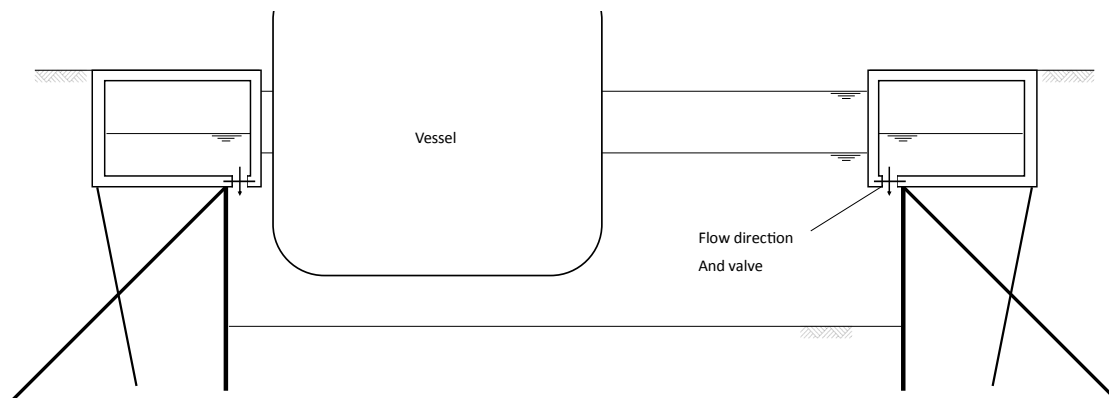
Cross section of a lock with a longitudinal filling/emptying system through the relieving floor
